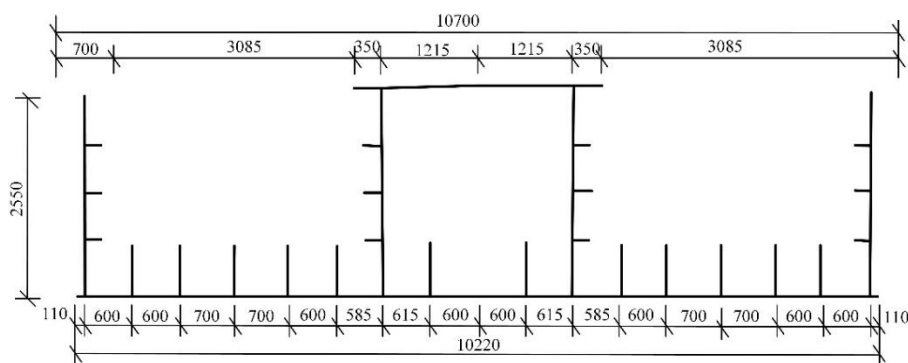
The bridge steel girder cross-sectional diagram (mm)
